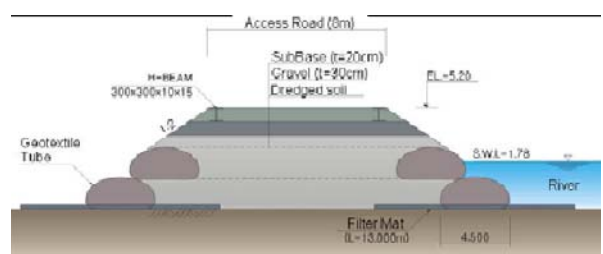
Cross-section of temporary access road made of geotextile tube for Ilsan Bridge constructions
